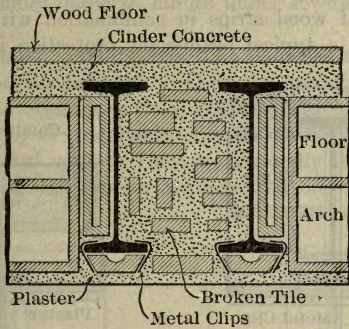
Girder Protection, Continental Trust Co.'s Bldg., Baltimore Fire.
